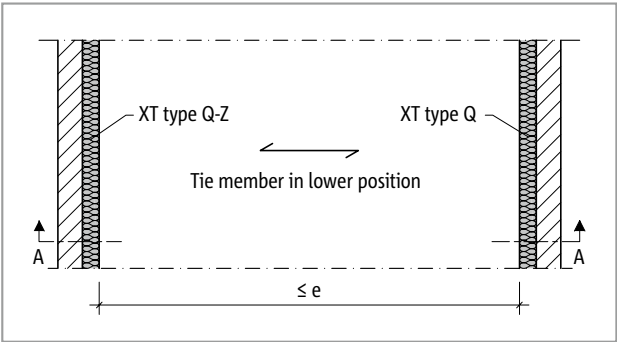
Schöck Isokorb® XT type Q-Z, Q: One-way spanning reinforced concrete slab
